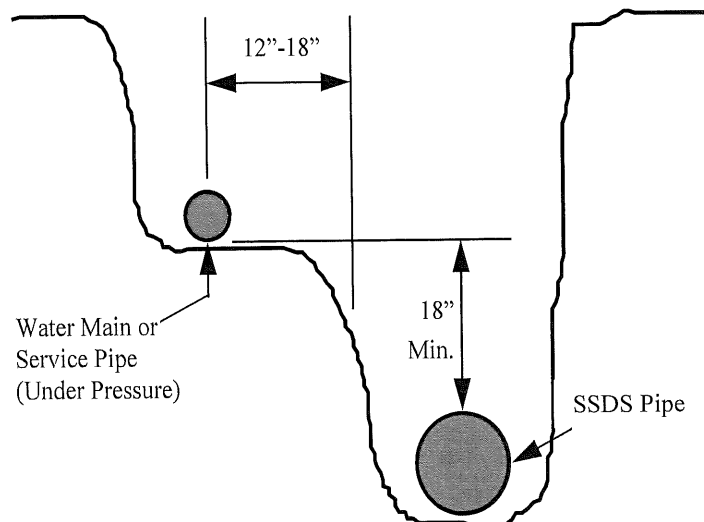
Pressurized Water Pipe and SSDS Pipe Trenches
